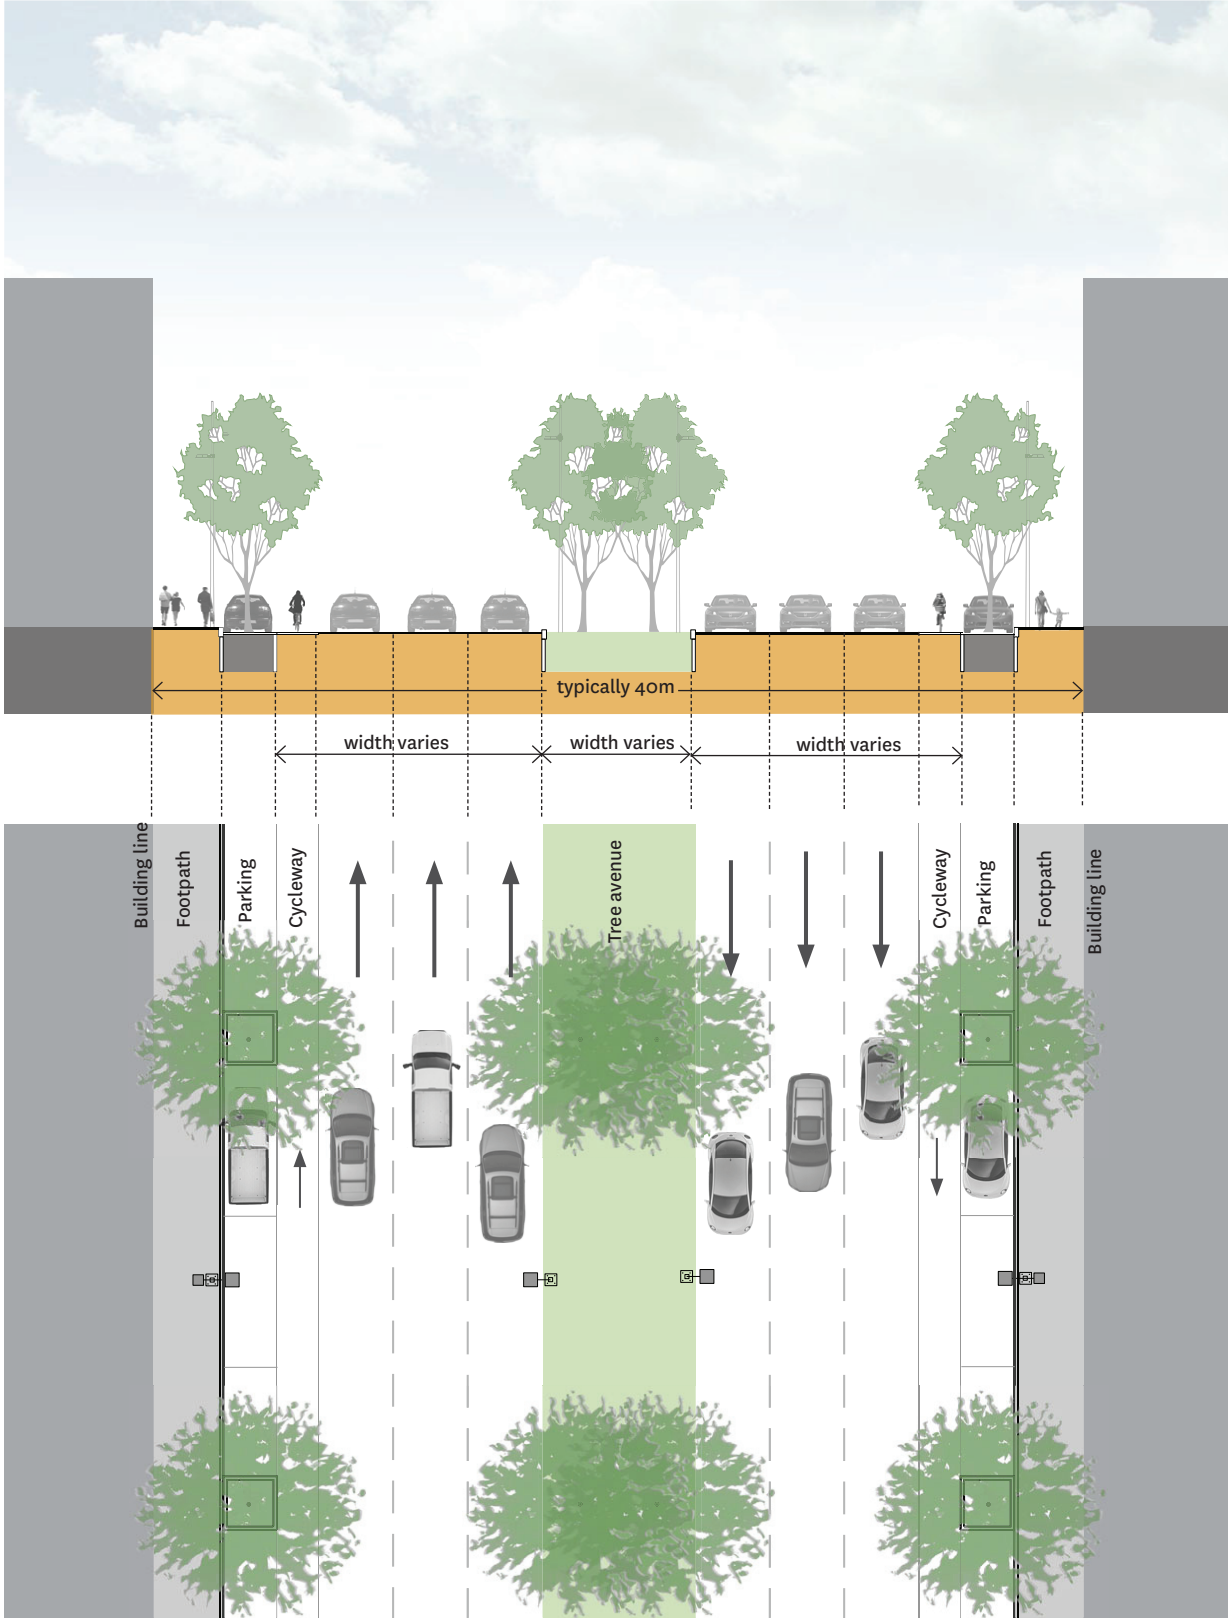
Moorhouse, Bealey and Fitzgerald avenues – typical existing cross-section
